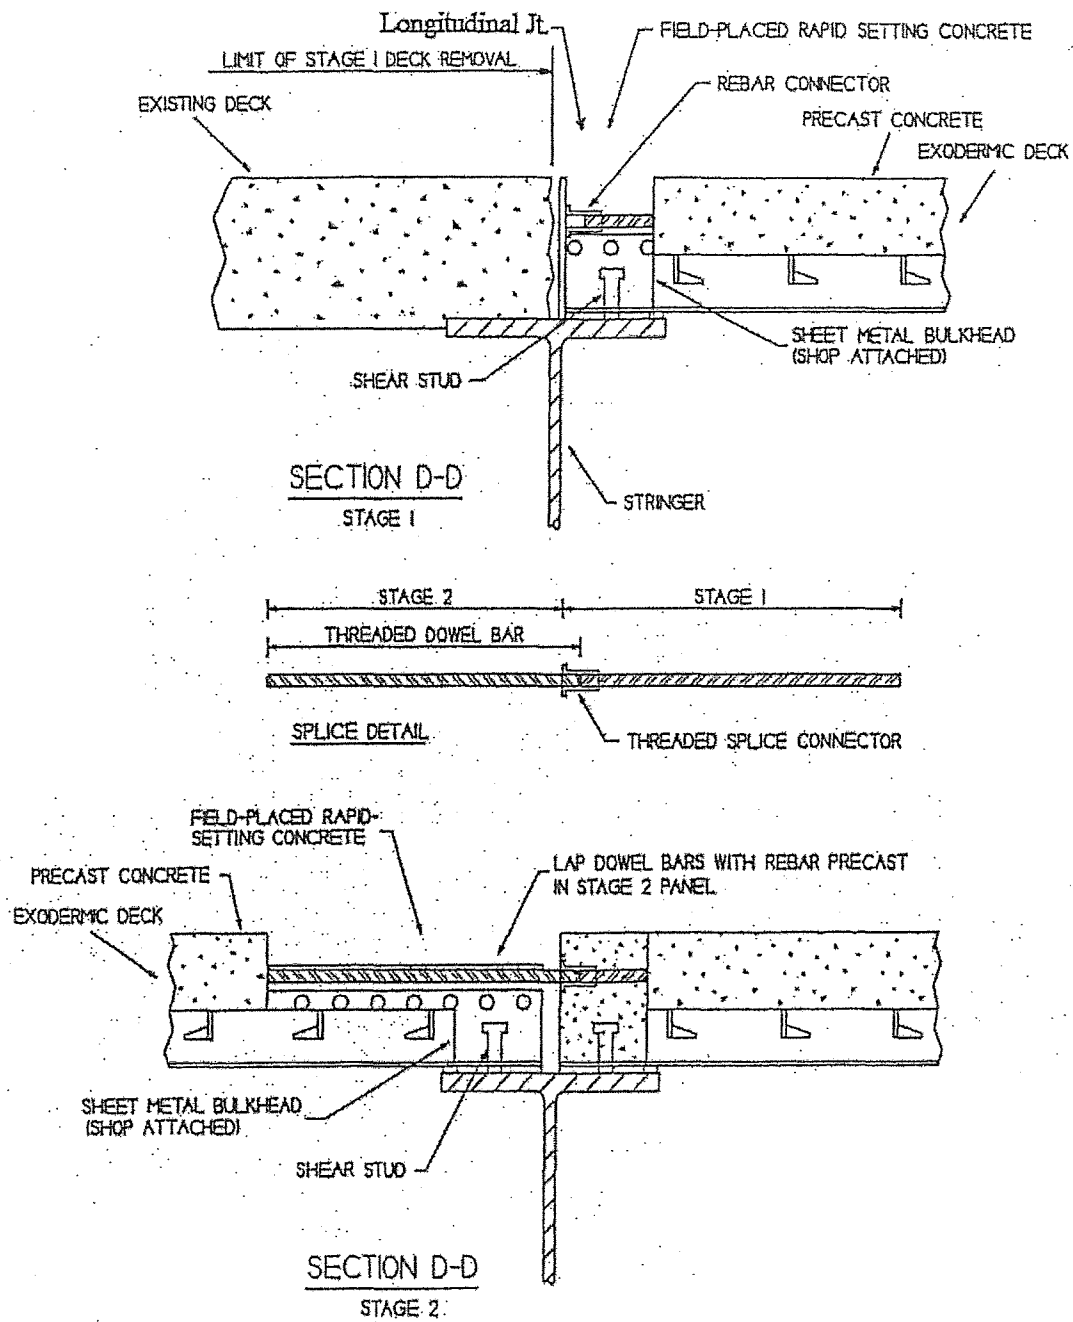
Longitudinal Deck Splice Detail for Staged Construction with Precast Exodermic Panels
